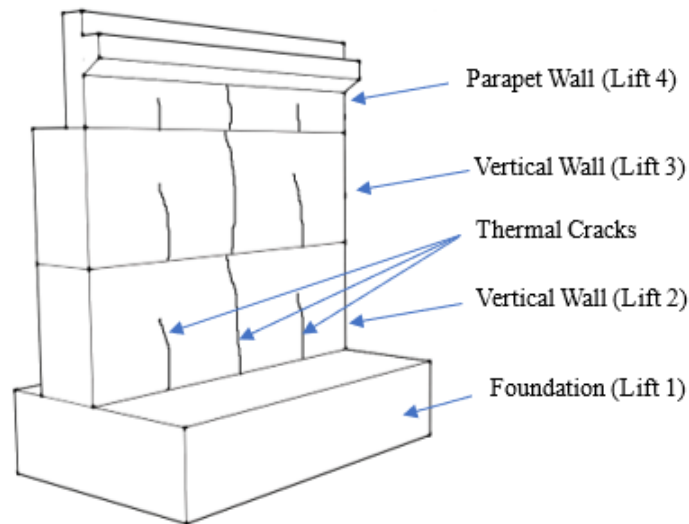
Typical example of RC abutment with multiple lifts and externally restrained cracks
